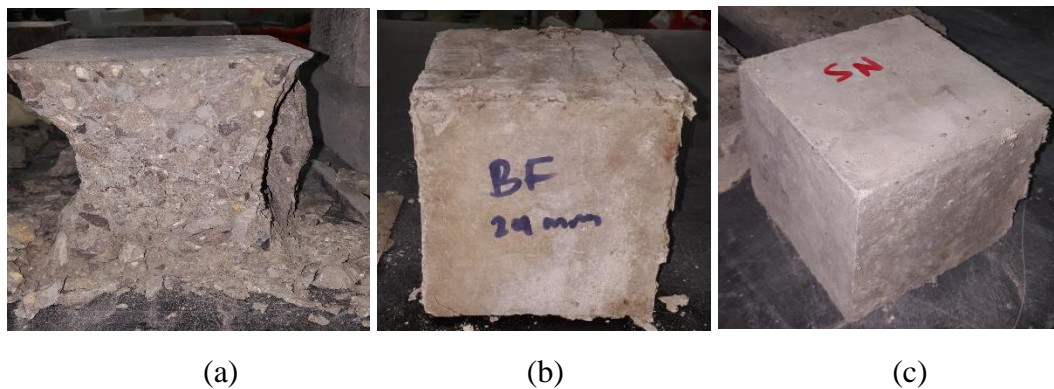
Tested specimens, (a) plain concrete, (b) basalt fibers concrete, (c) synthetic fibers concrete
